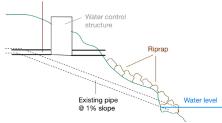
Overall design schematic sketch, showing required excavation and recommended additions
